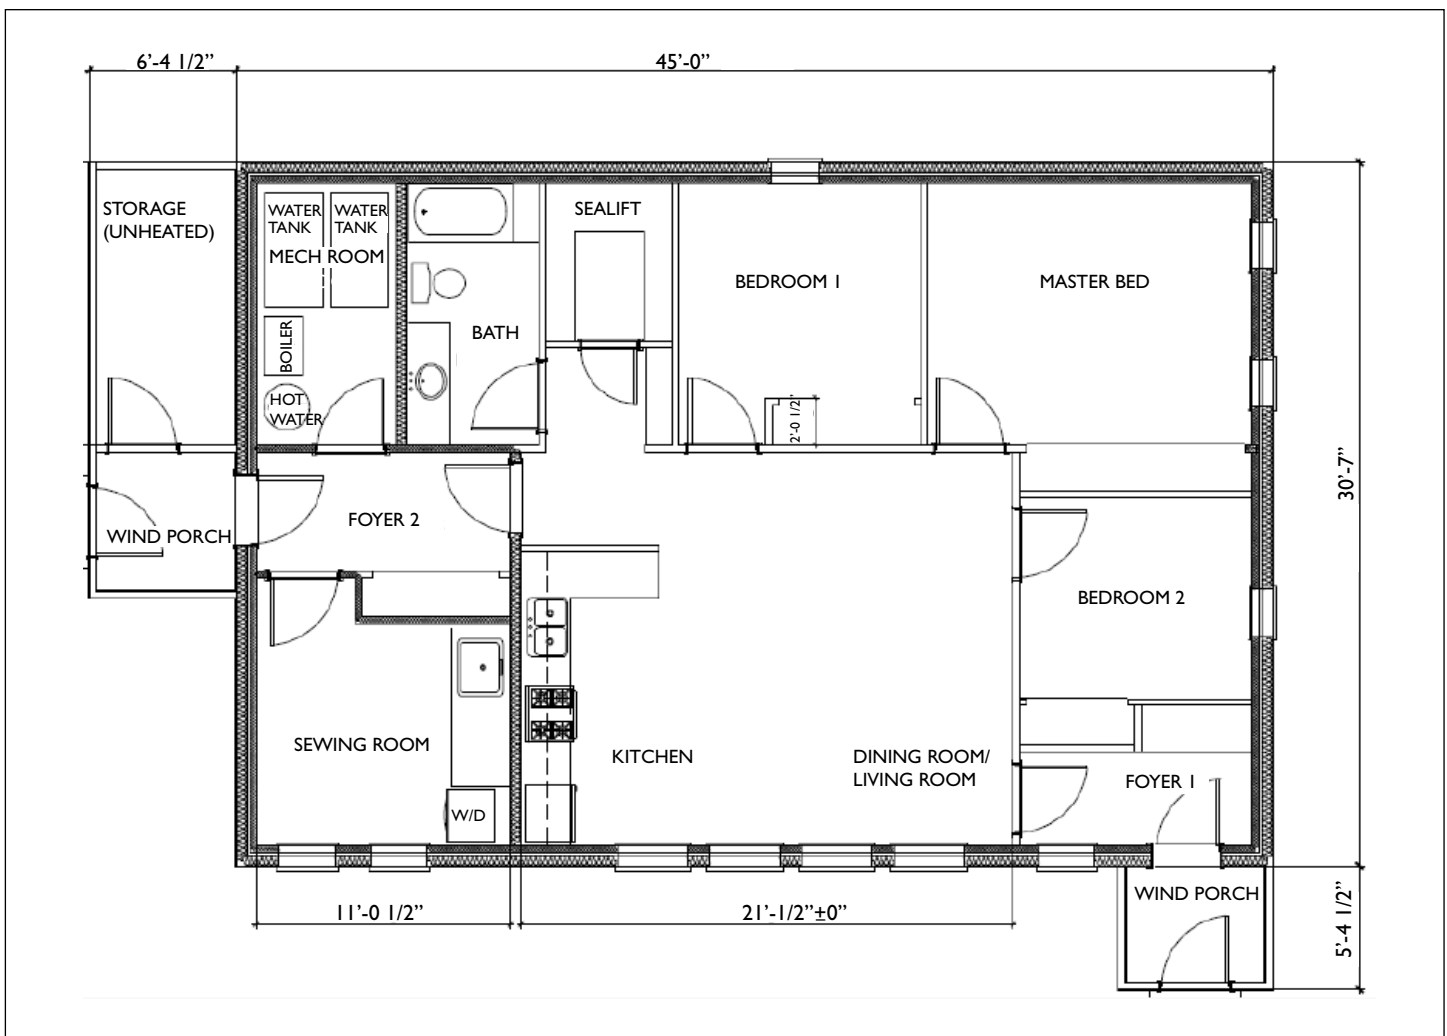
Floor plan of the Northern Sustainable House in Arviat (Credit: NHC)
